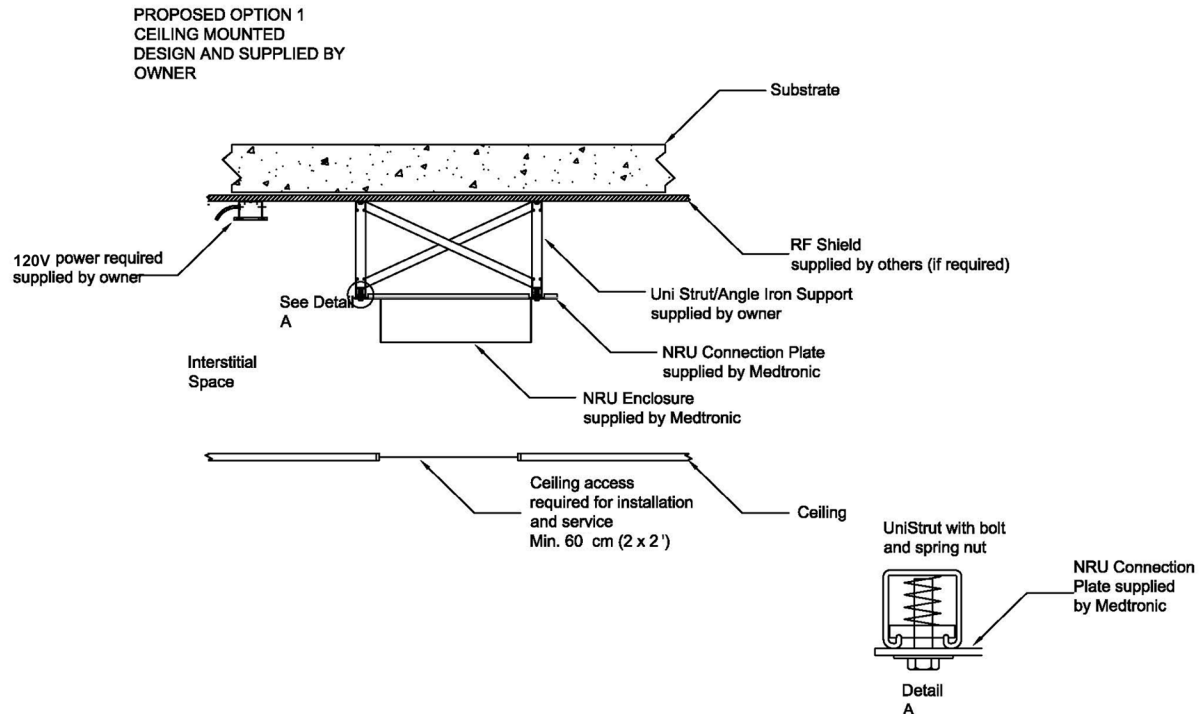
Proposed detail for unistrut horizontally mounted NRU
